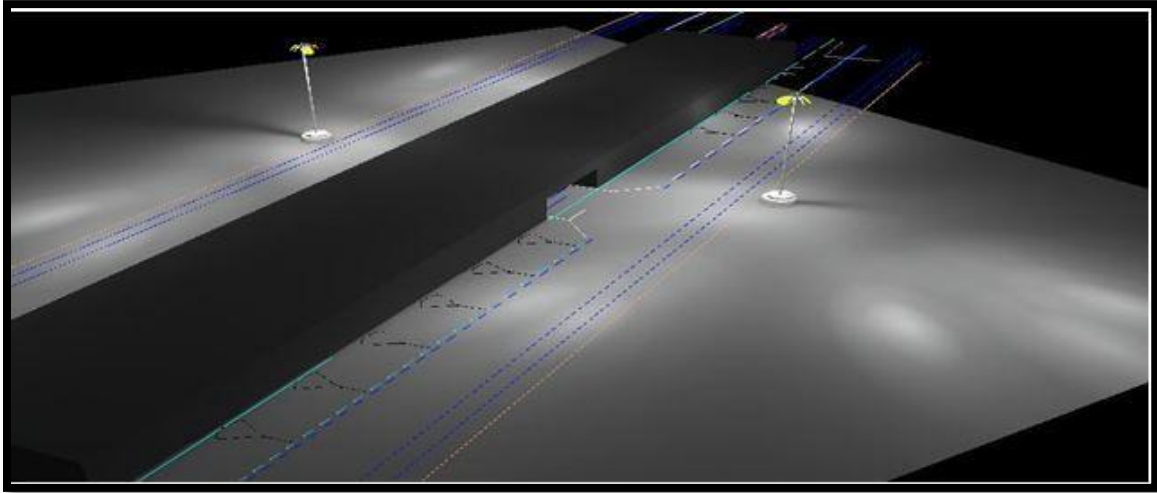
Plan view of Vehicular Under-Pass CH: 140+324
